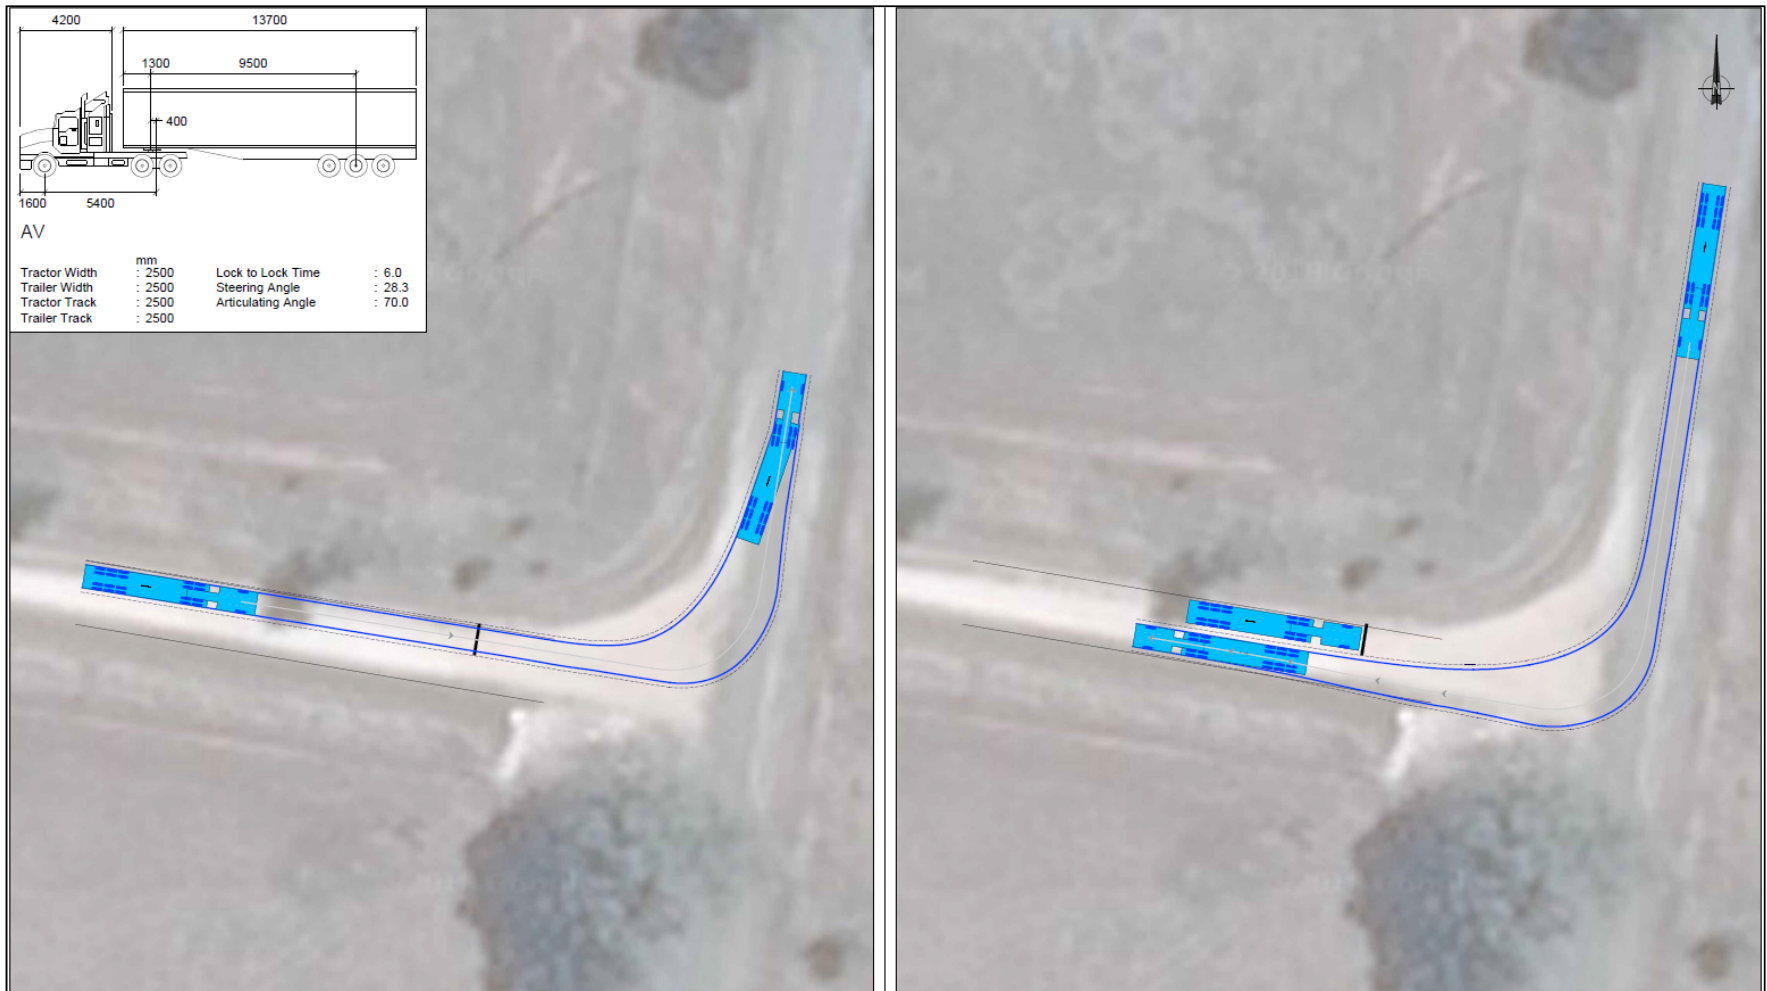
Proposed AV turning from Muntz Road to Sandigo Road
